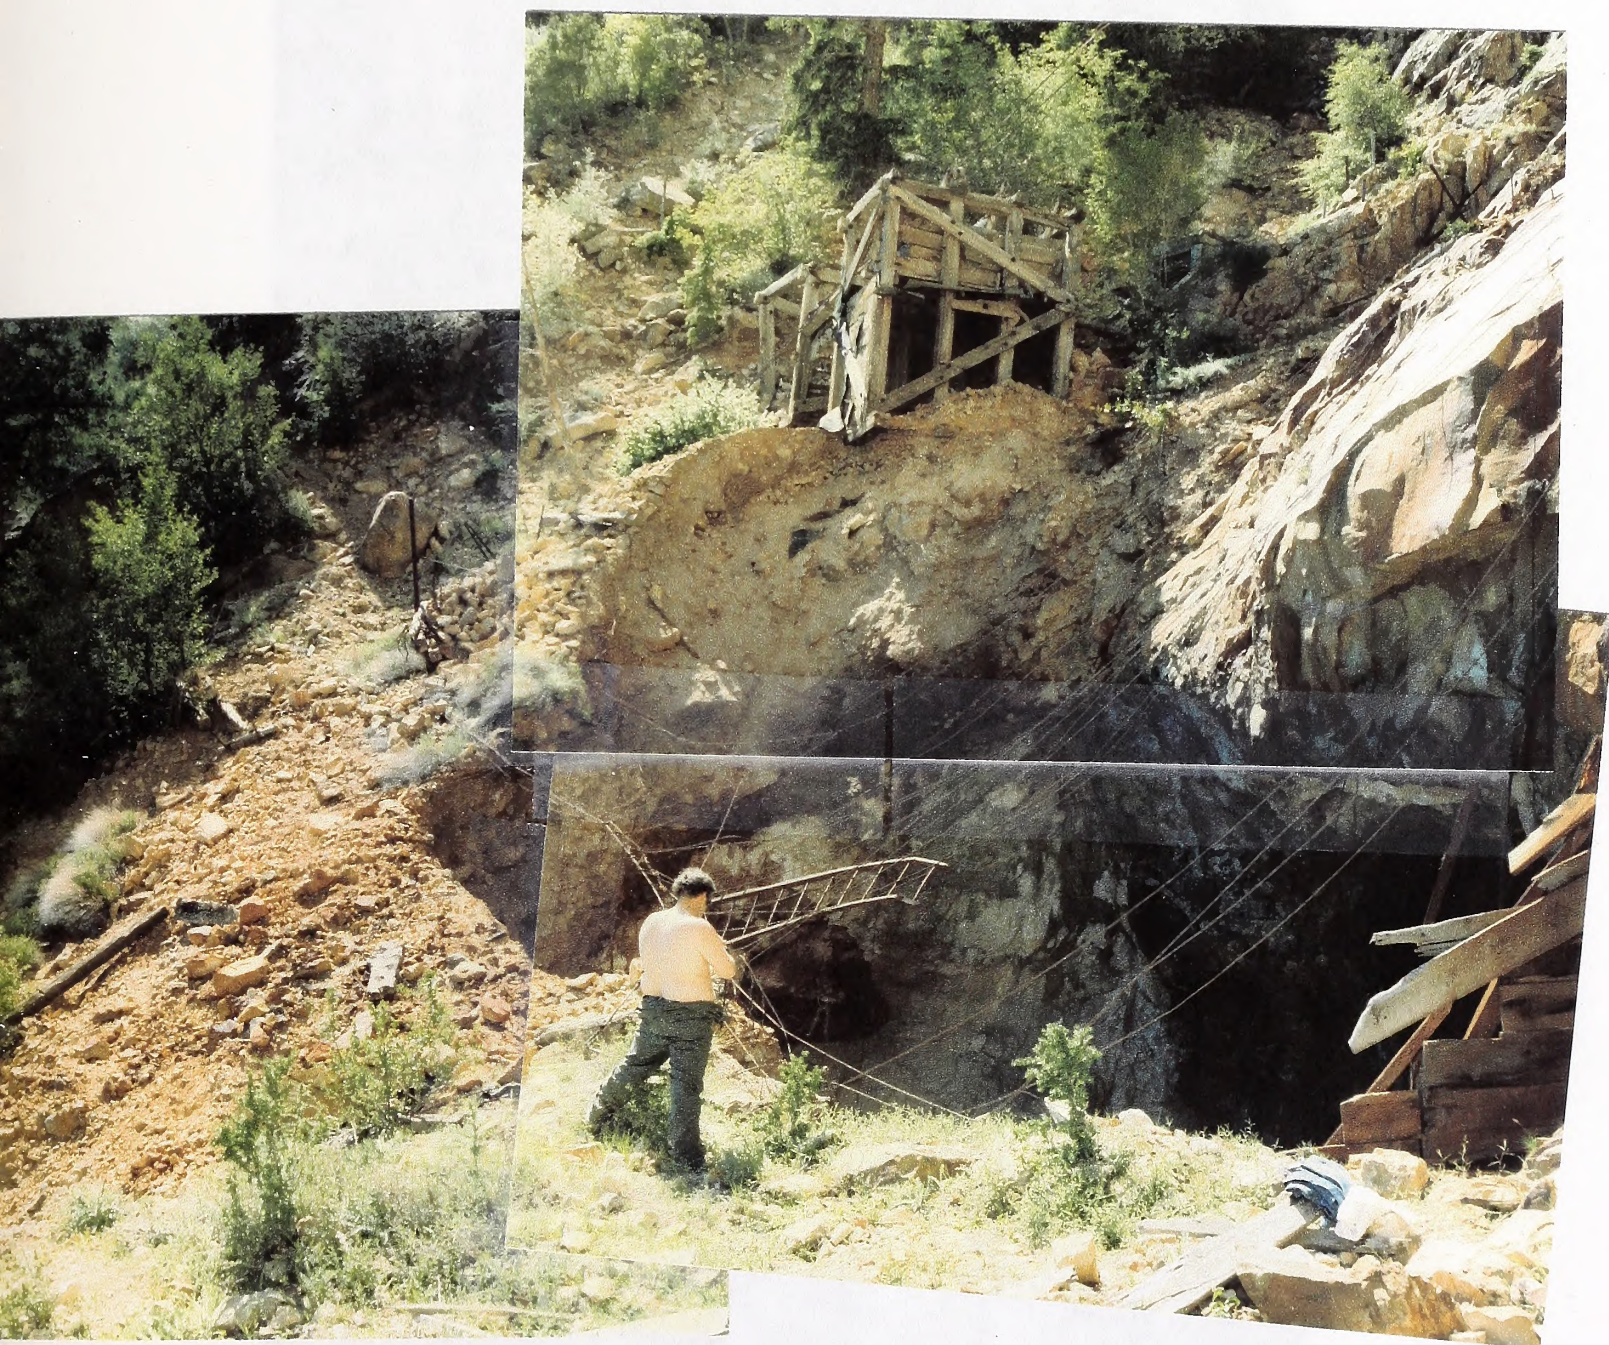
This photo is a closeup view of the open subsidence hole and low aerial tramway tower shown in Photo #4. The cables and wooden planks were an apparent attempt to isolate the open hole from men and equipment in the area.
